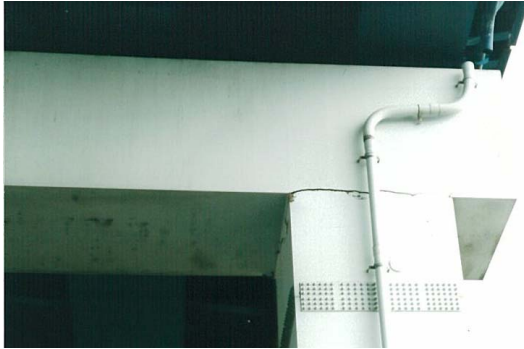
A brittle crack in the beam-to-column connection of a steel frame-type pier
